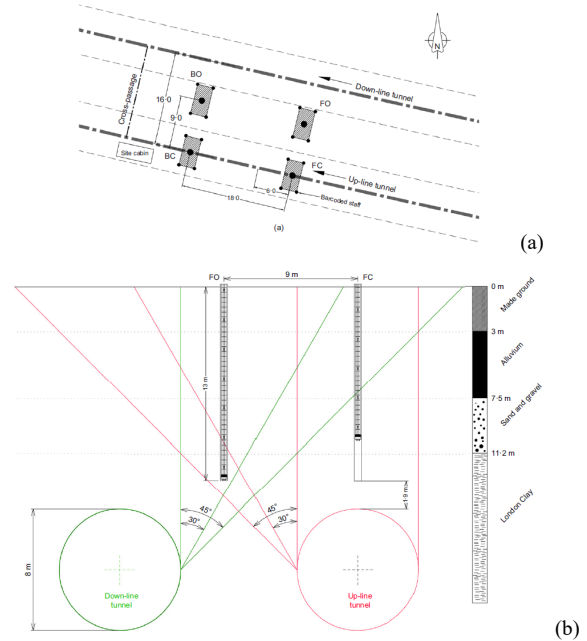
Plan view (a) and cross-sections of instrumented piles ((b) with reference to twin-tunnel alignment (Selemetas *et al.*, 2013)
